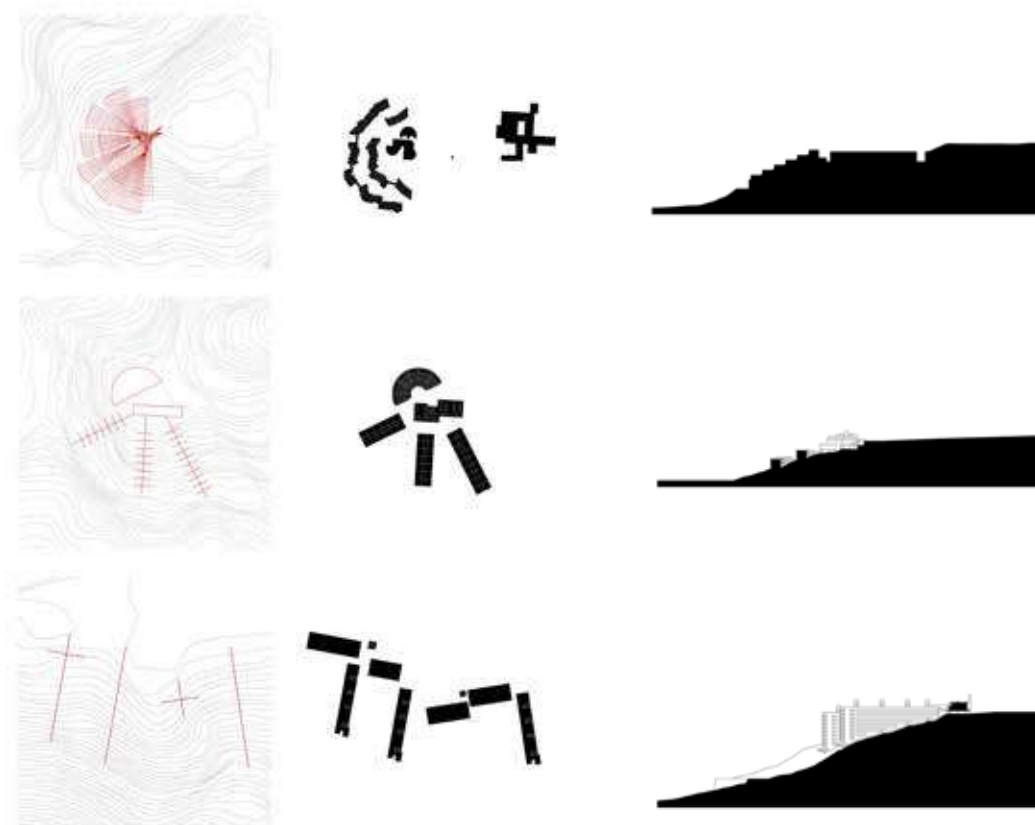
Giancarlo De Carlo. Projects for Urbino. “Il colle”, “Il Tridente”, “La Pineta”. Interpretative drawings: planimetries and sections. Drawings by the authors.
